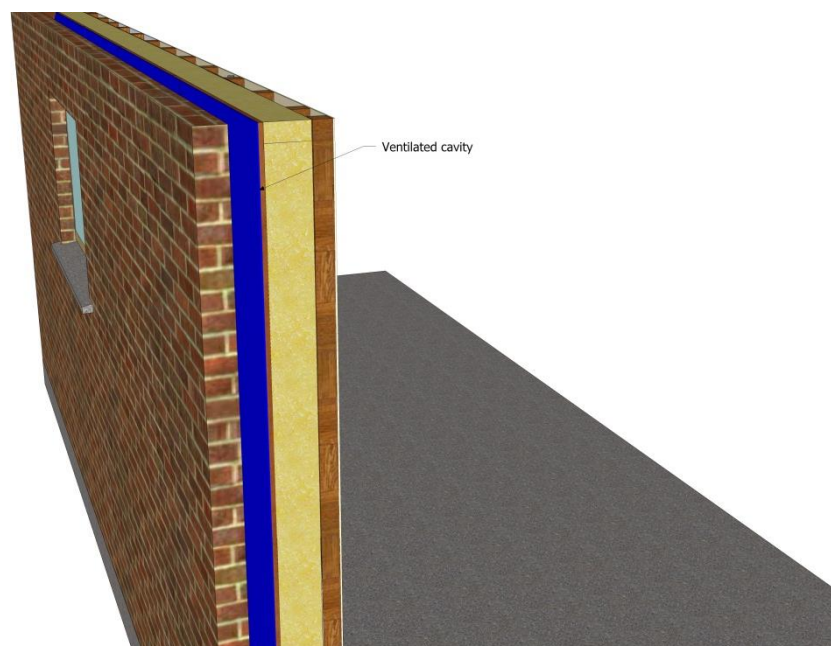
Diagrammatic section of standard open panel timber frame wall showing ventilated cavity
